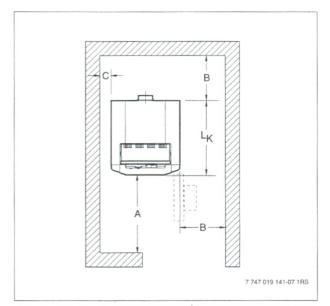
Boiler room clearances (boiler positioned on the l.h. or r.h. side)
